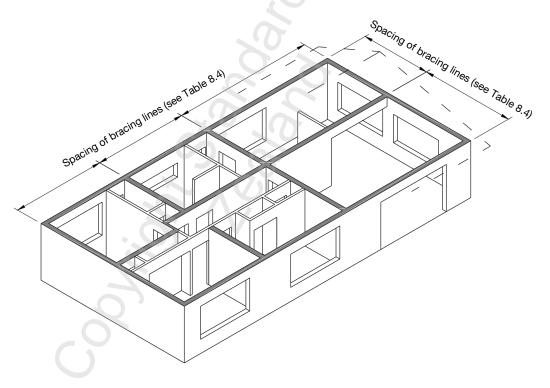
Bracing line support system (see 8.4.2(a))
